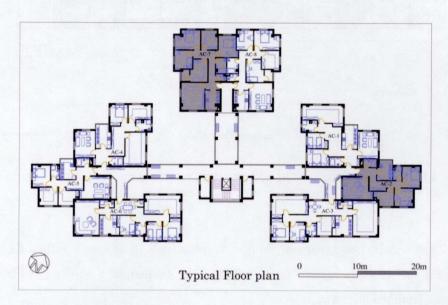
A typical floor plan of 39 surveyed apartments in *Shahrak-e-Aria* (Source: Author's Illustration) The apartments that are used by tenants are shown darkened
